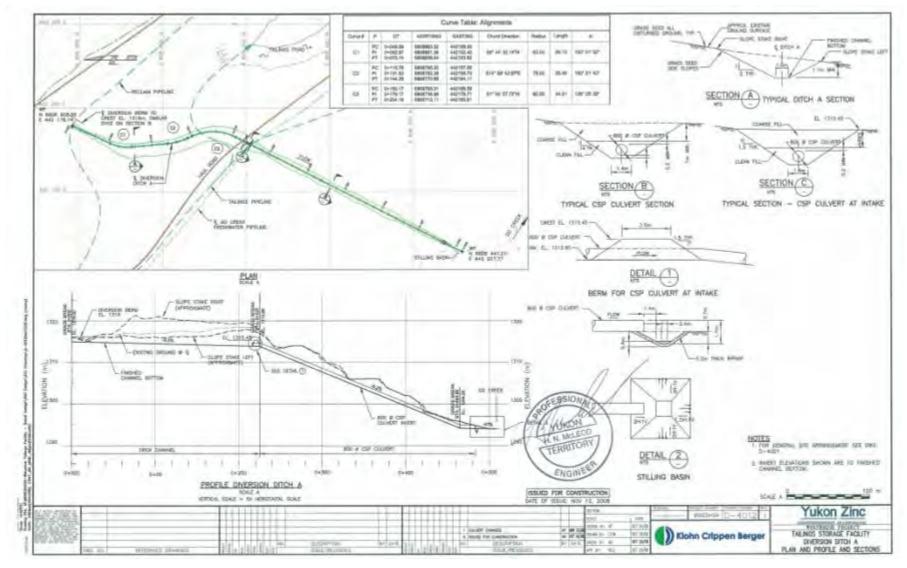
Diversion Ditch A: Plan and Profile and Sections
